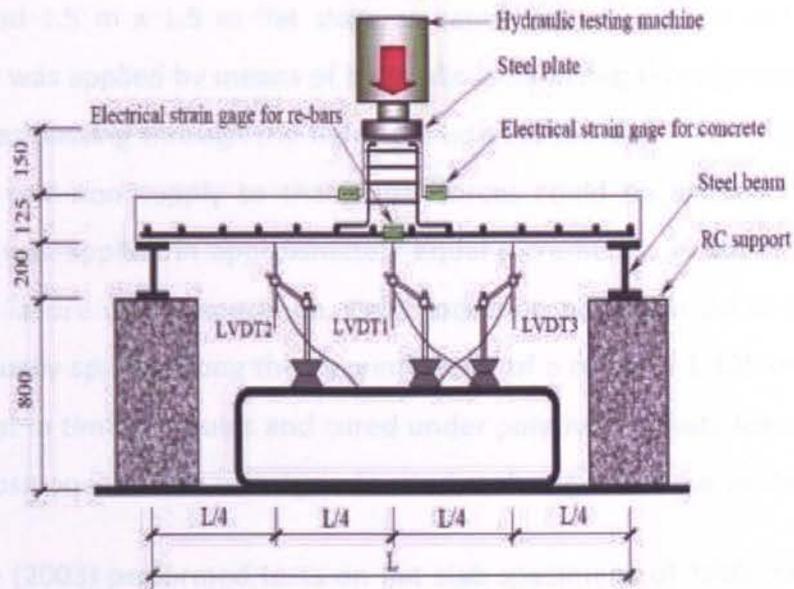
Arrangements for testing a Slab Specimen (Nguyen et al 2010)
